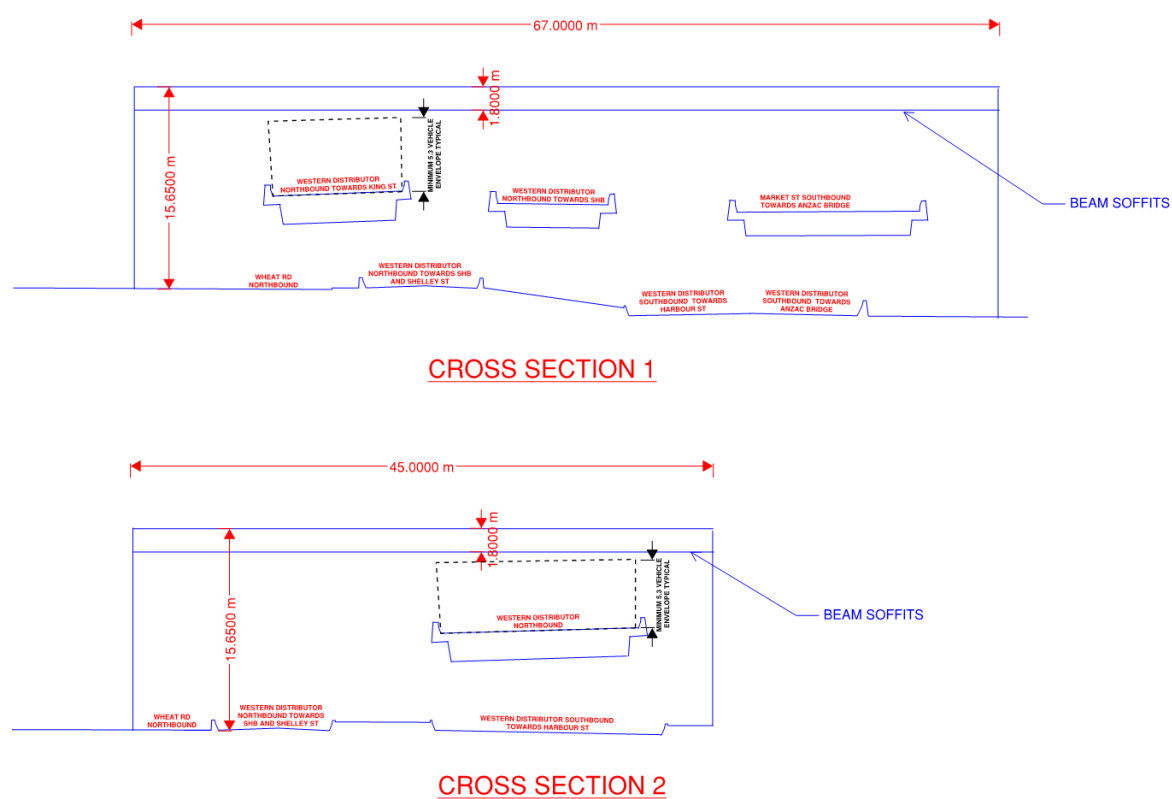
Indicative cross sections of roadways beneath the proposed land bridge (dimensions are approximate only)
